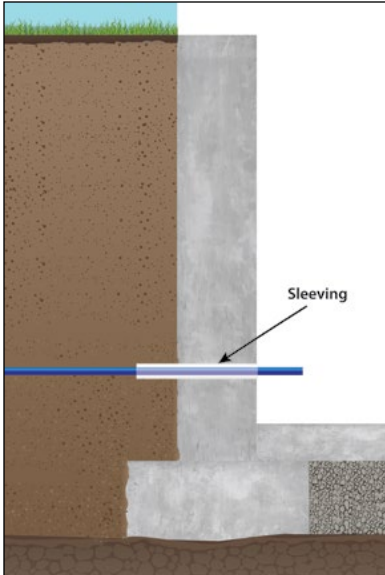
PEX Tubing Protected Against Pinching or Shearing at a Foundation Wall Penetration
